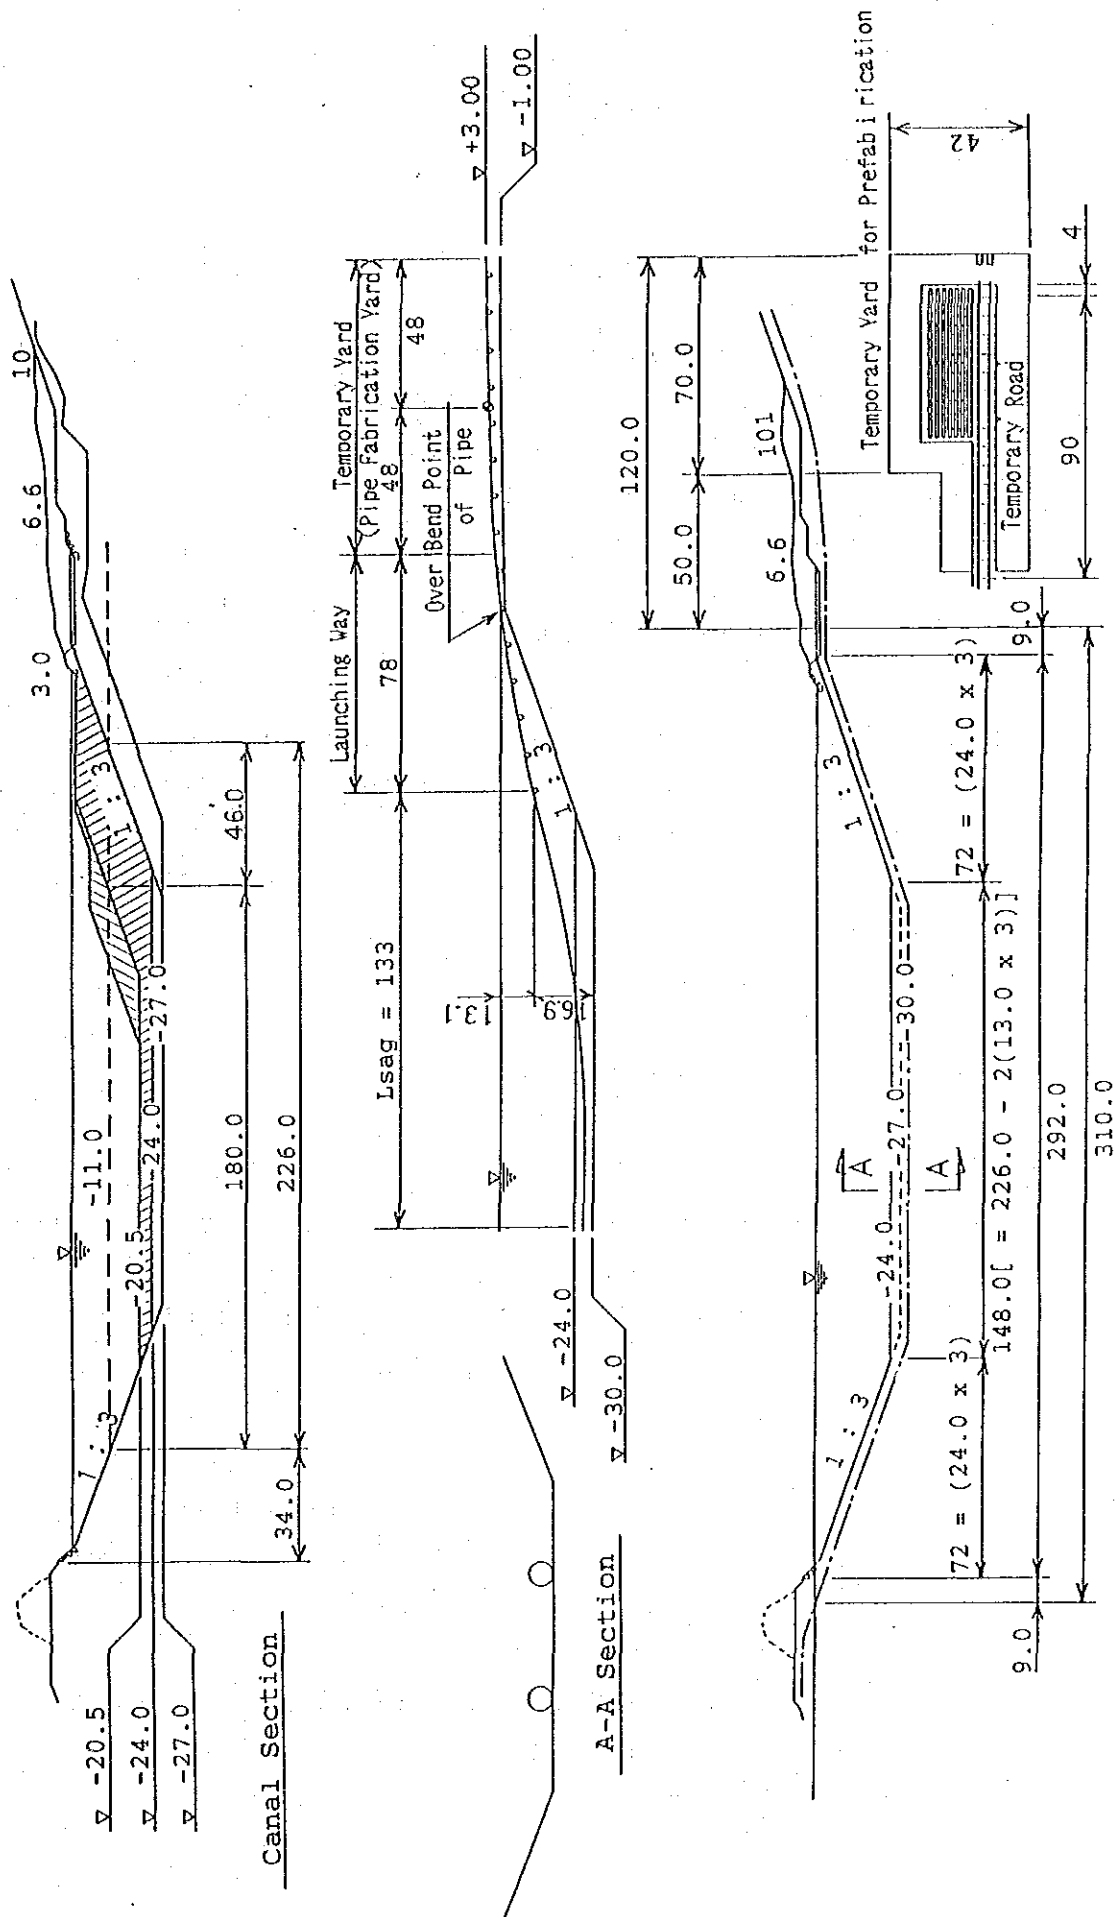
Suez Canal Section and Pipelines Crossing Under the Canal
